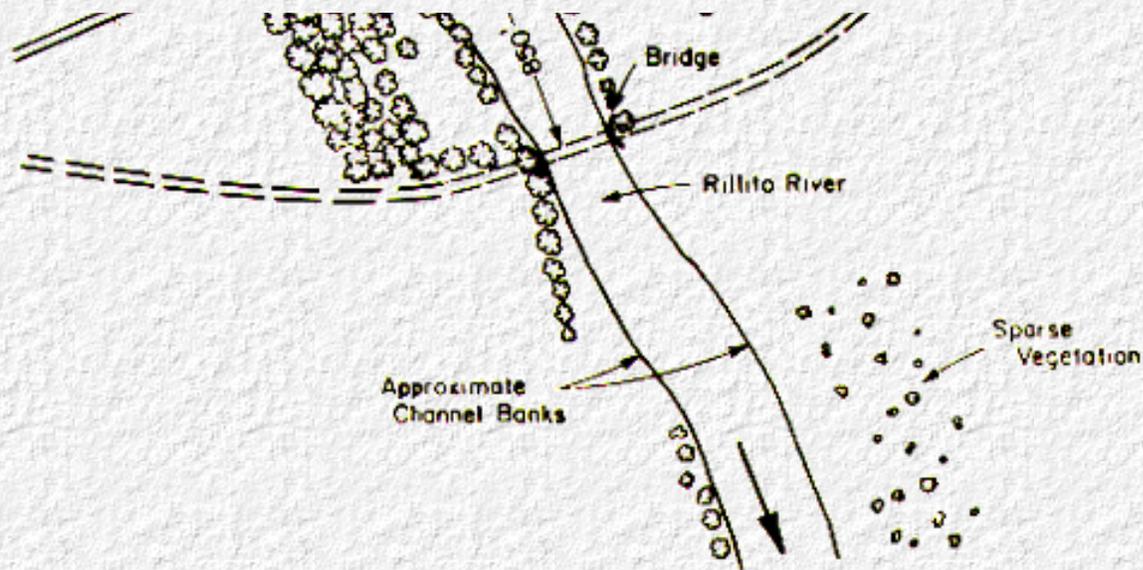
Alternative II for Craycroft Road Bridge Crossing
